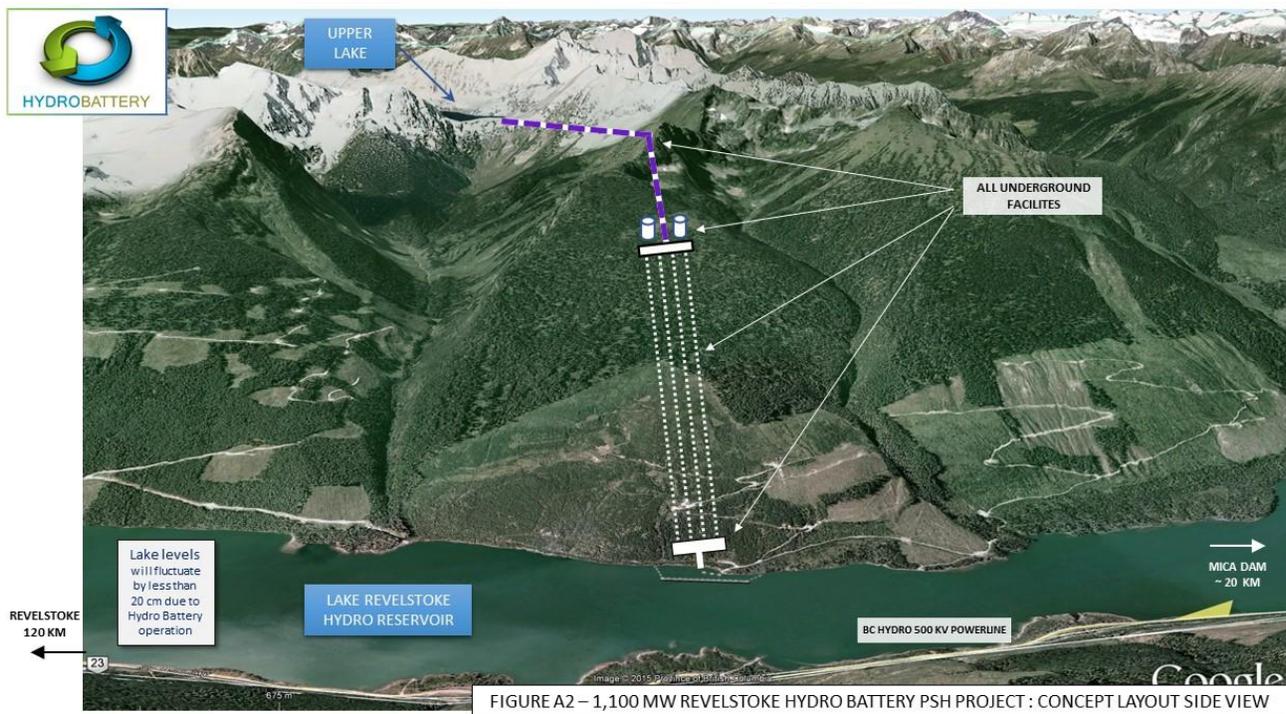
Conceptual Layout of 1,100 MW Hydro Battery (Source HBI)
